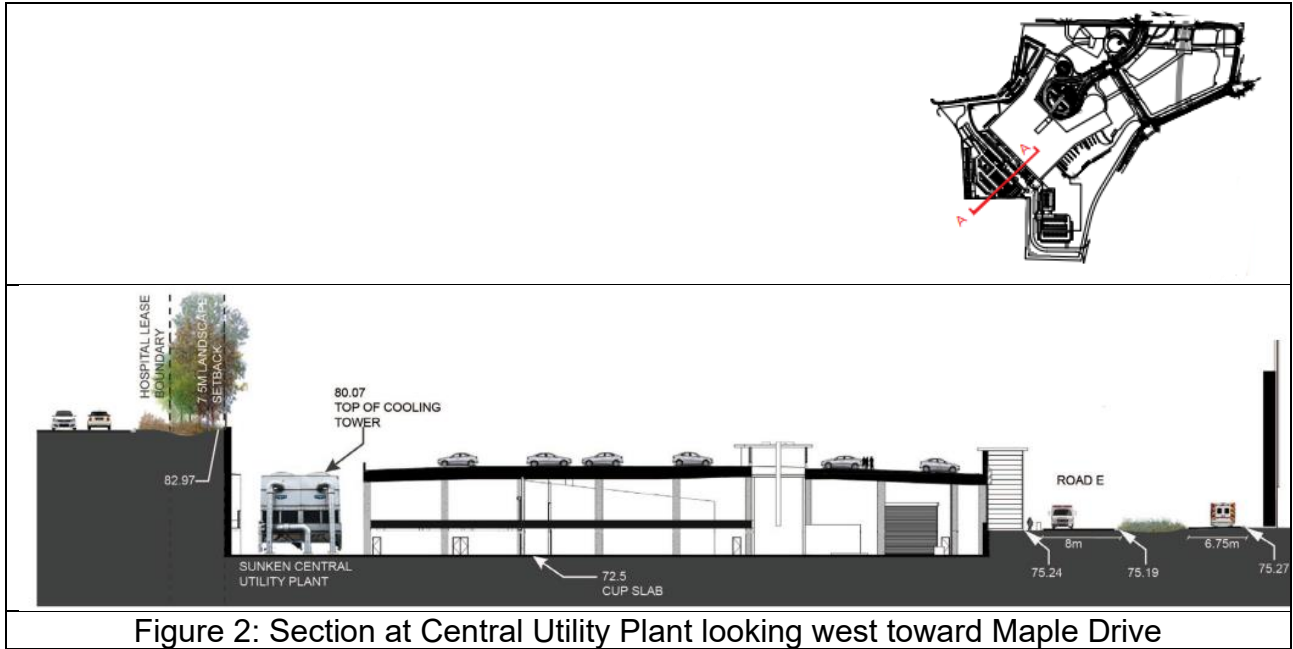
Section at Central Utility Plant looking west toward Maple Drive
